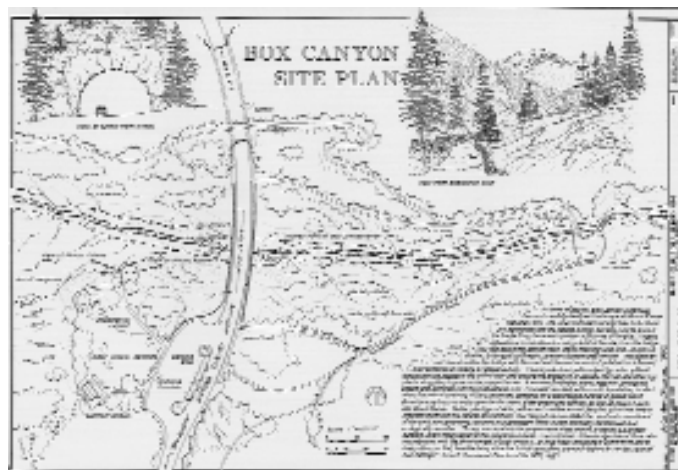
The Box Canyon site is drawn in plan, showing details of the roadway and setting, from the wood fence, and plantings. Drawn by Julie Ann Dickson. HAER, 1992.
